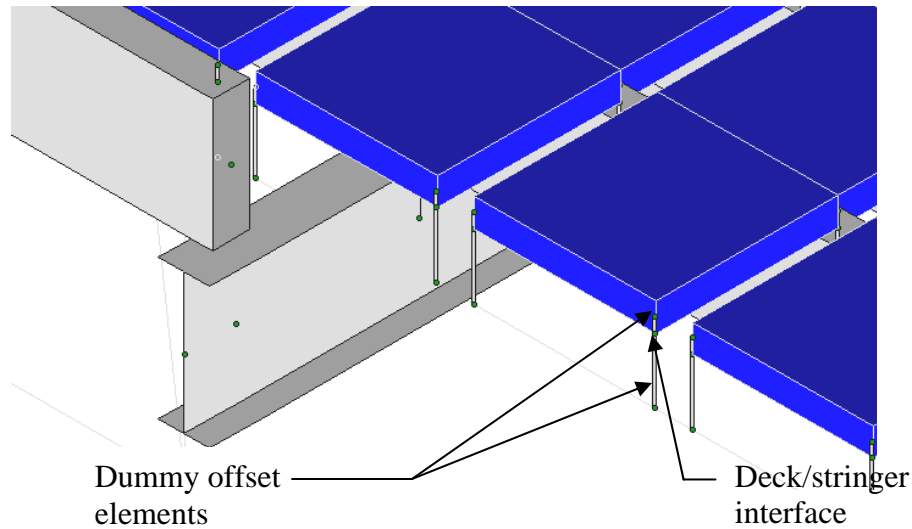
Fruita Bridge: Rendering of the timber deck planks on timber stringers on steel floor beam. For clarity, one stringer has been intentionally not shown, although its centerline is shown. Dummy offset elements, from the stringer centerline to the deck/stringer interface and from the deck/stringer interface to the center of the deck plates, can be seen. There is a rotational release at the location of the deck/stringer interface. As with Figure 2.8, the rendering was produced by RISA-3D.
